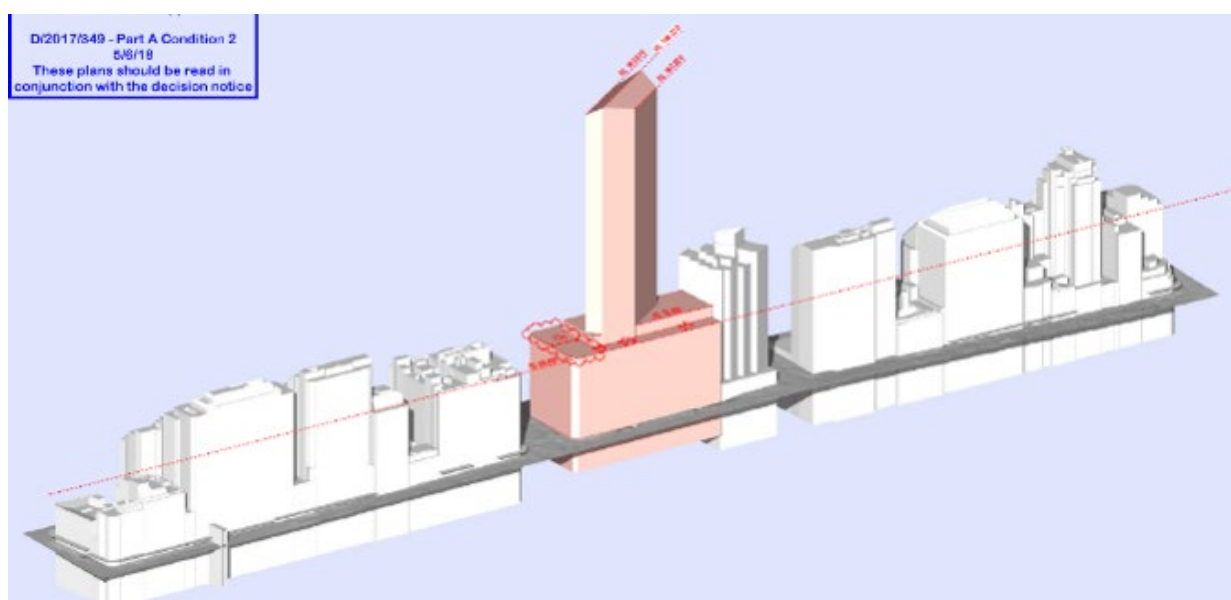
| Approved envelope north-south Castlereagh Street elevation for D/2017/349
